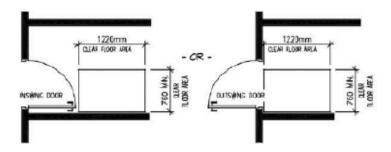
CLEAR FLOOR AREA BEYOND SWING OF DOOR
